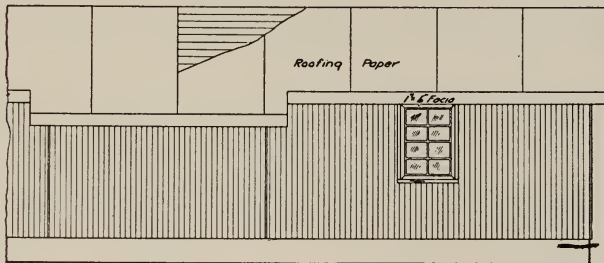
Rear elevation of brooder house showing extension of roof over supply and utensil room.
